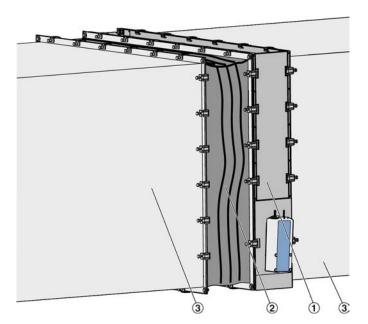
EK-JS connection to a sheet steel smoke extract duct
